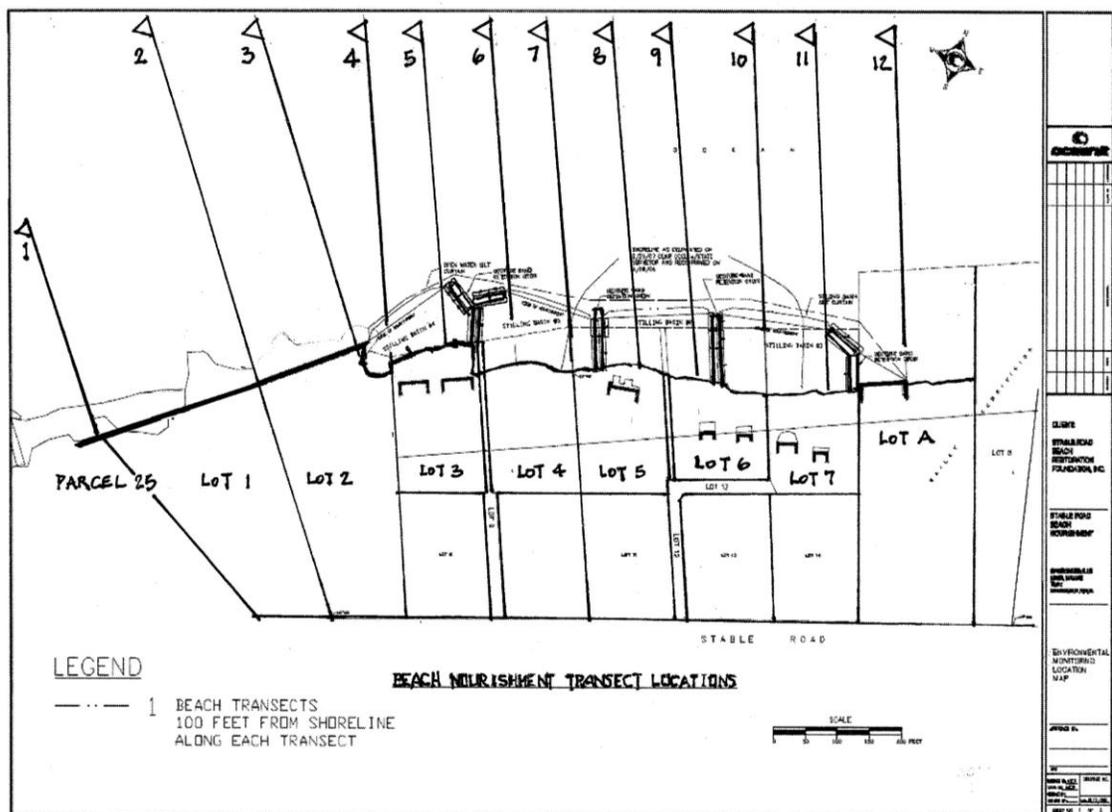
Site Plan Showing 12 Survey Transect Locations
